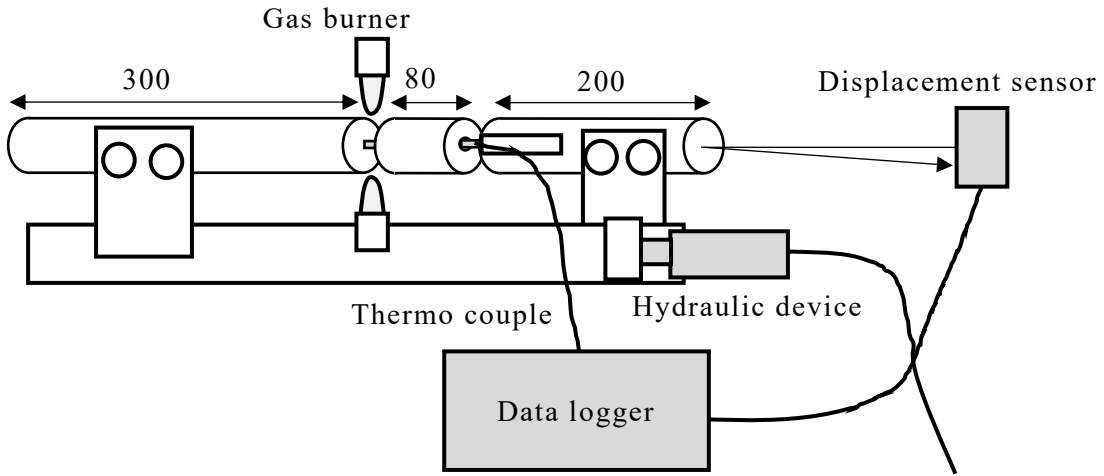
Schematic illustration of gas pressure welding for steel bar
